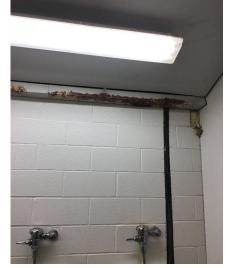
Gutter Below Concrete Seating Deck, Exposed Condition.
